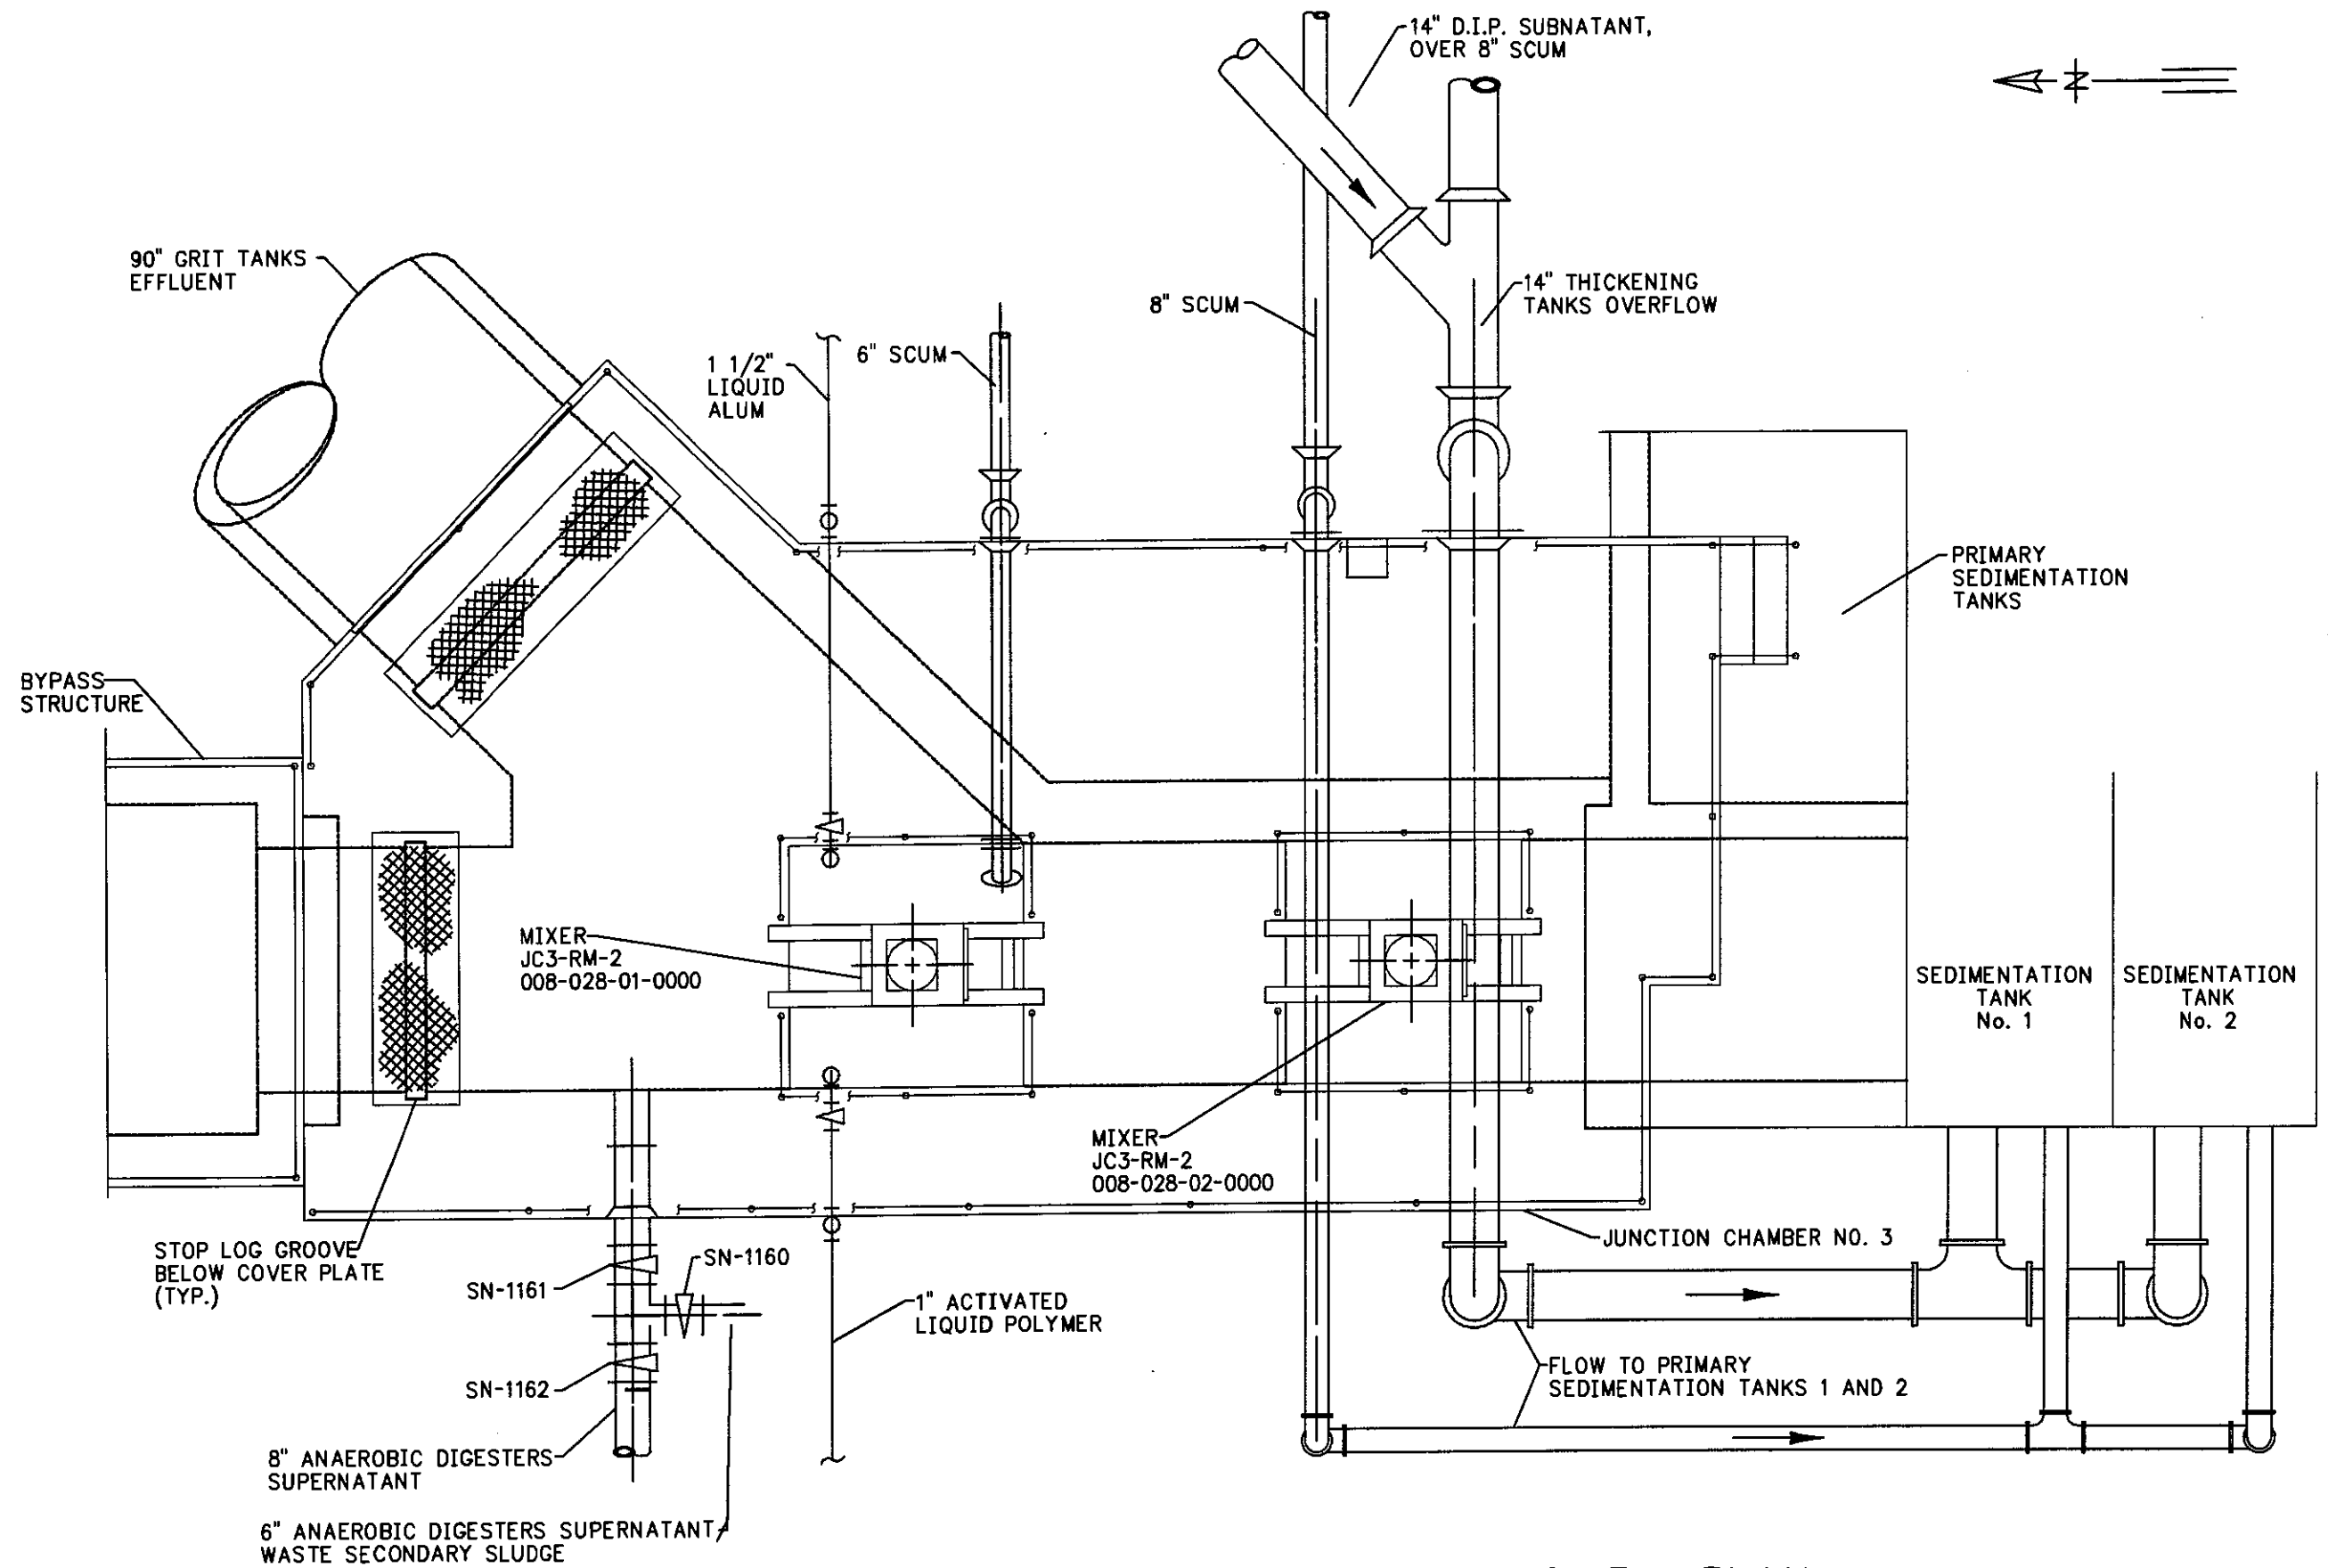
JUNCTION CHAMBER NO. 3 - PLAN
